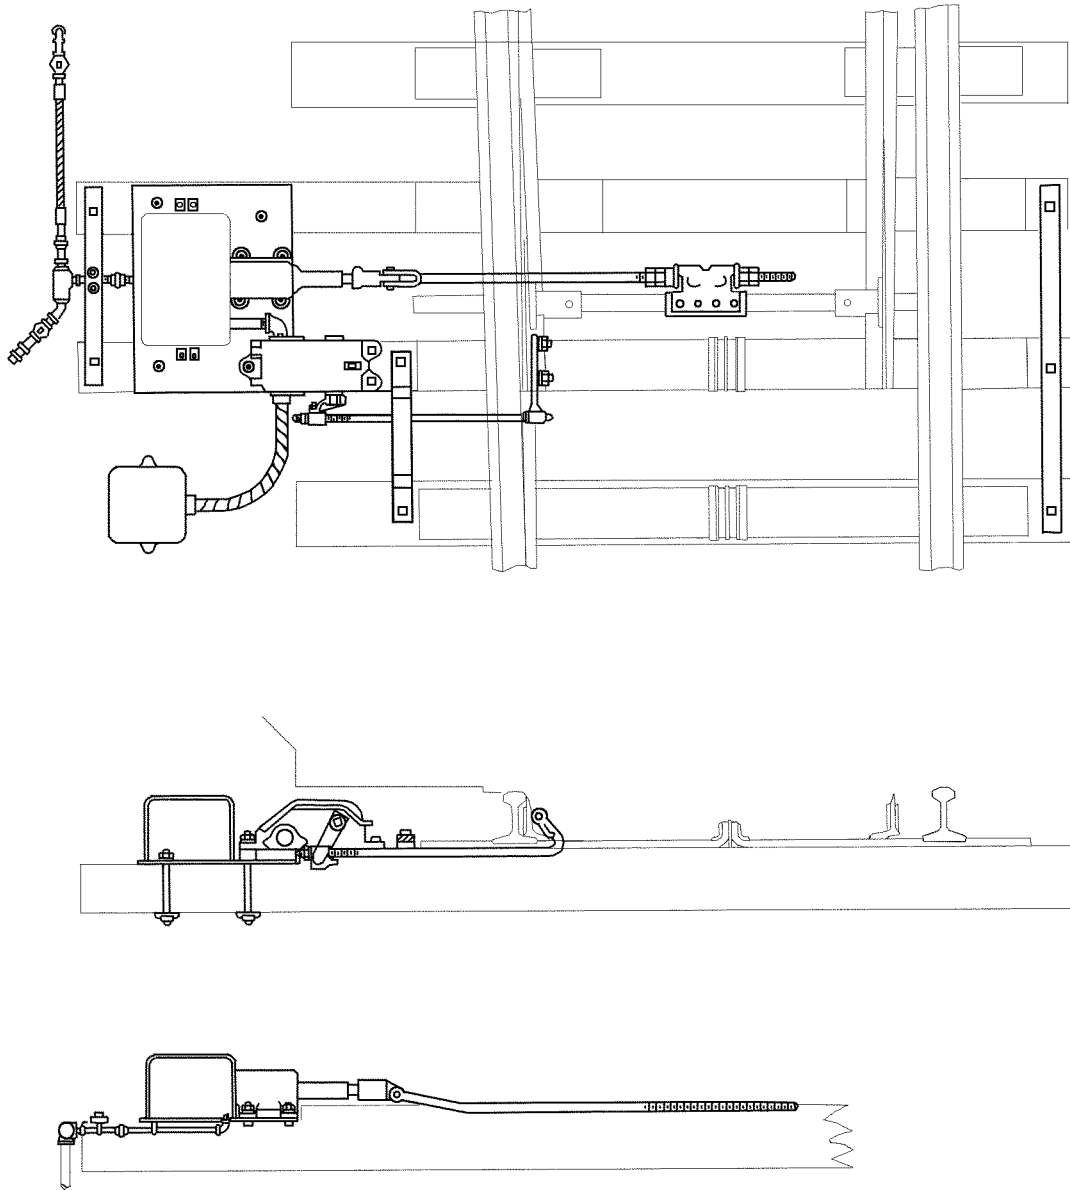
Typical Layout of Style DA-10 Switch Machine
